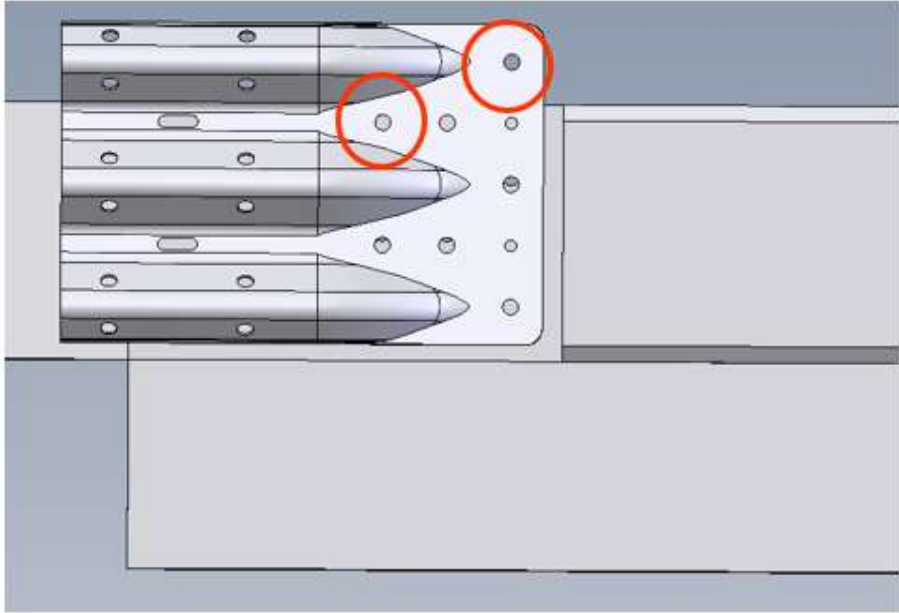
Top Bolt Position with a 29-in. Tall Buttress
